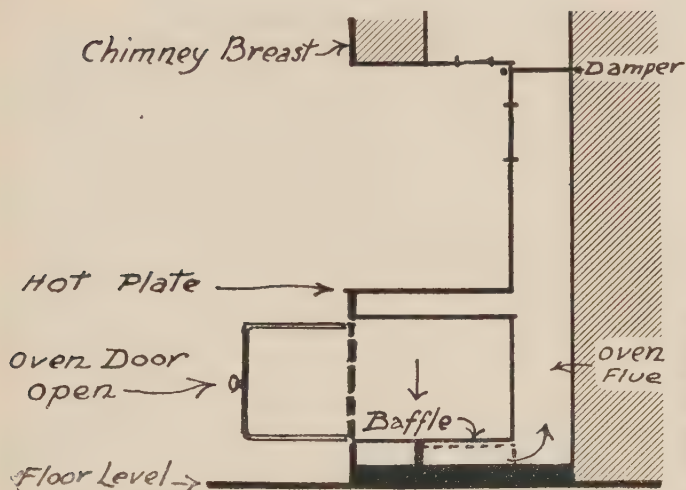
KITCHEN RANGE: SECTION AT OVEN.
